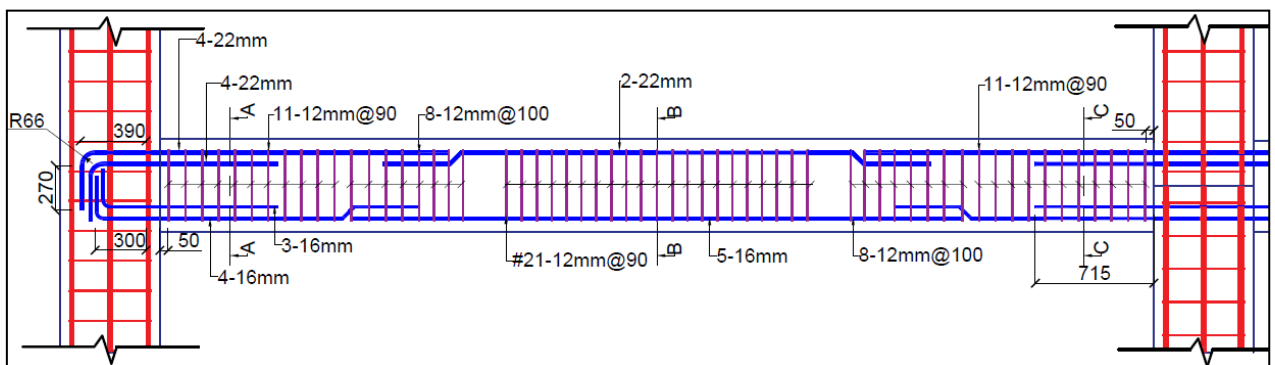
Beam-Column Connection (beam #99, columns #3,4,15, and 16).
